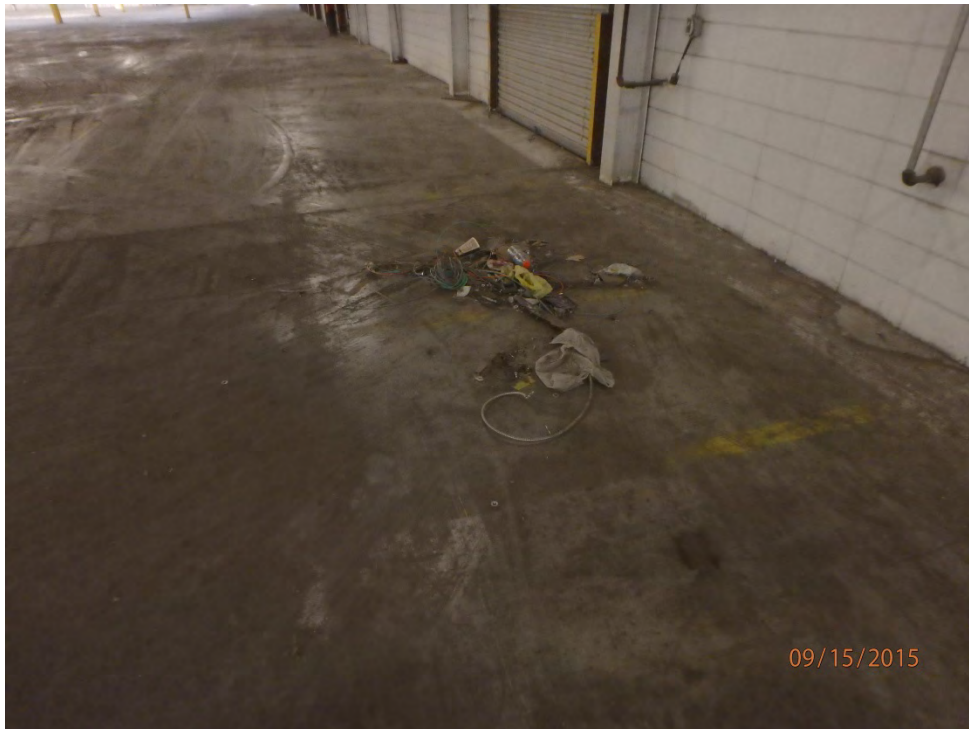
Debris and dust on floor along north wall of main warehouse in former sorting area.
